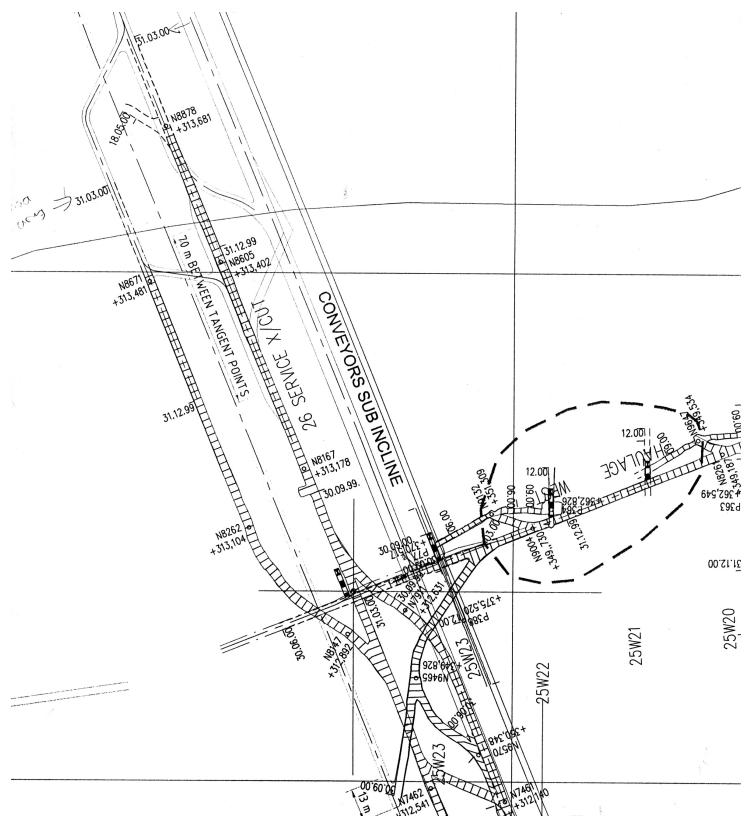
Plan of the site near a fault at Western Platinum Mine
